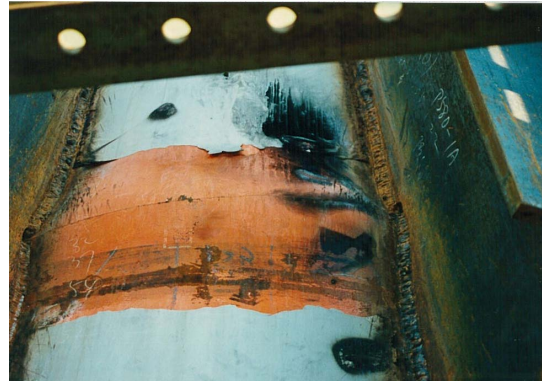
Low-cycle fatigue cracking due to excessive plastic buckling deformation of bridge pier
